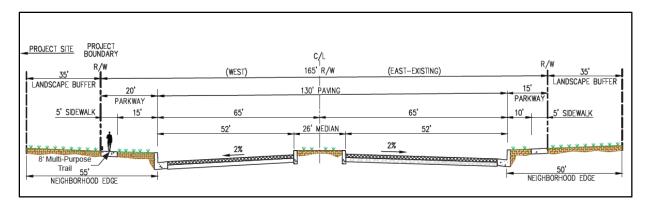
Archibald Avenue (165' ROW) Typical Landscape Street Cross Section
